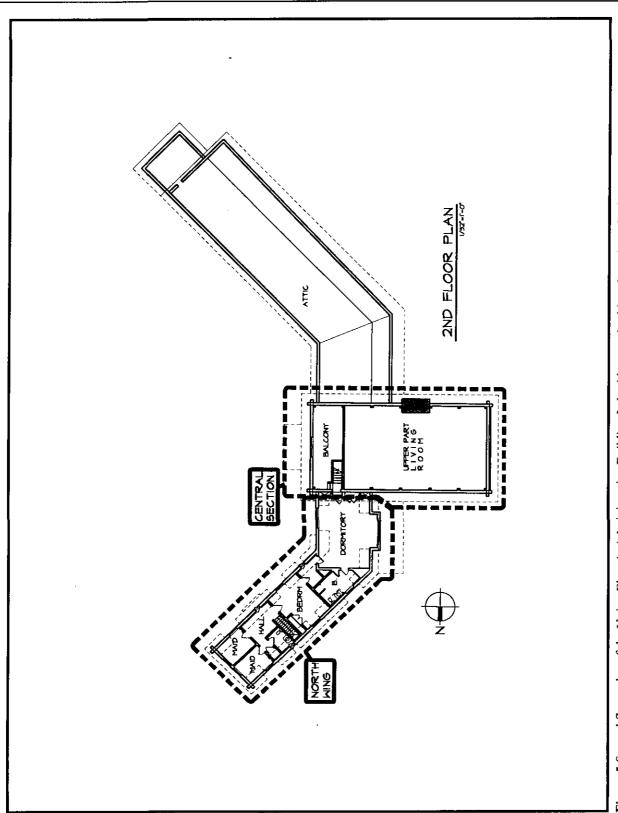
Second floor plan of the Union Electric Administration Building-Lakeside organized into 3 sections. Scale: 1/32"=1'-0"
